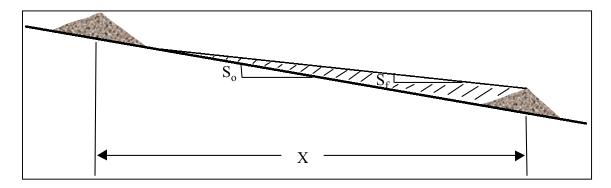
Spacing of grade control structure (adapted from Mussetter 1982)
